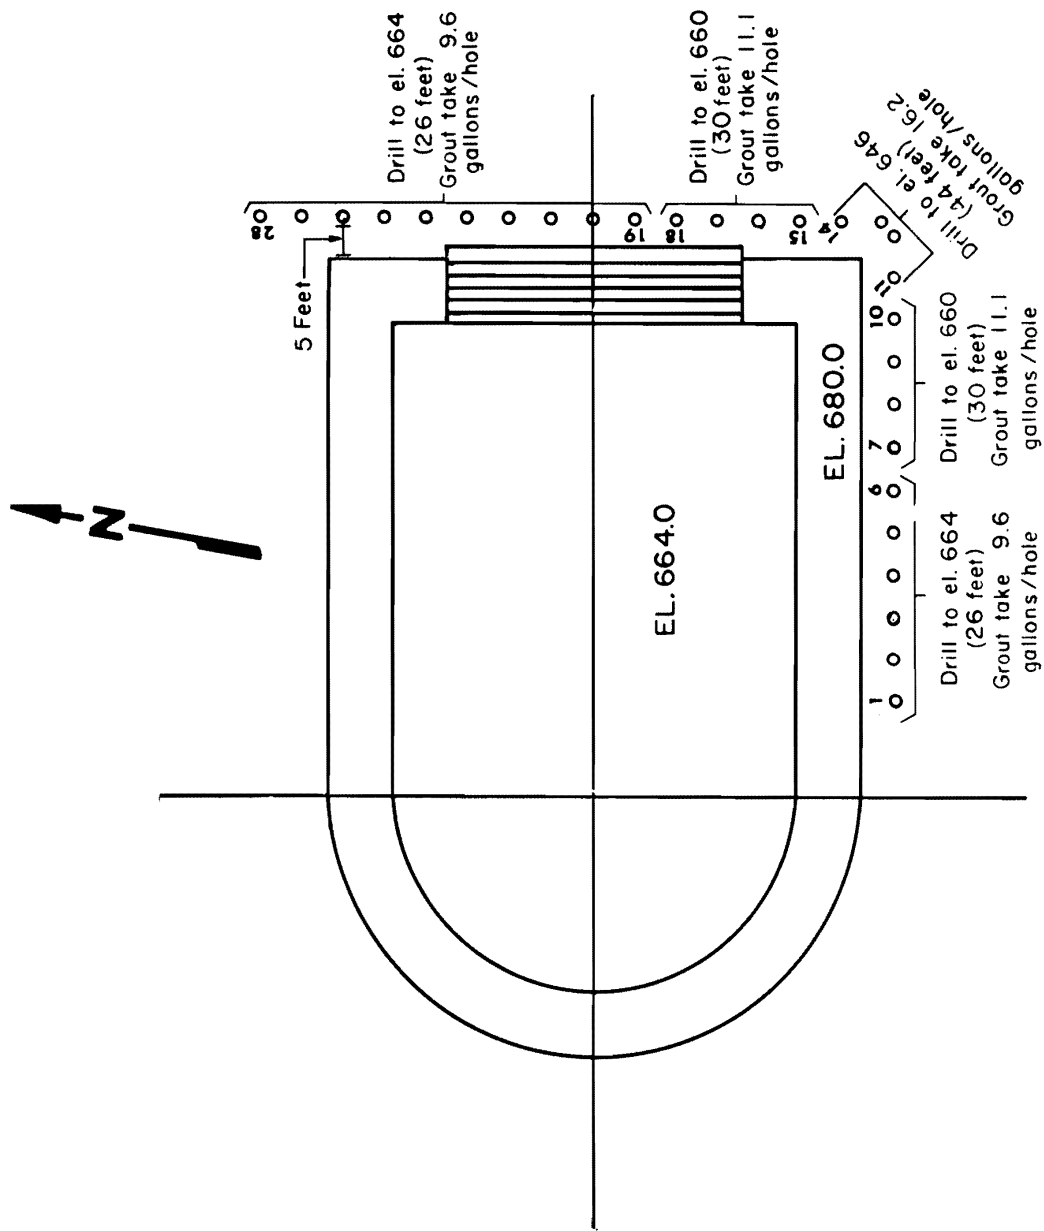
Drill Layout Diagram For Vertical Holes Viewed Onto The 671 Elevation
